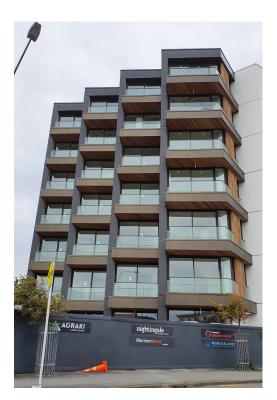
STAGGERED BALCONIES MAXIMISE PRIVACY WHILE RETAINING OUTLOOK AND SUNLIGHT ACCESS (WELLINGTON)
